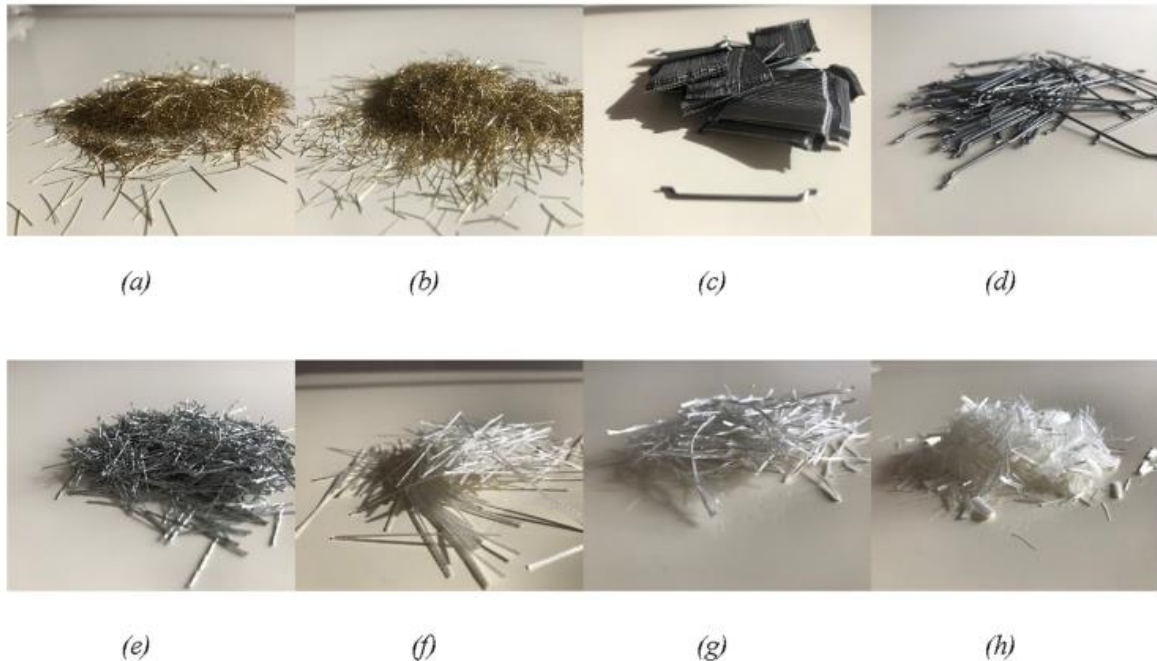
Synthetic and steel fibers used in concrete structures. Source: Abellan [62].
